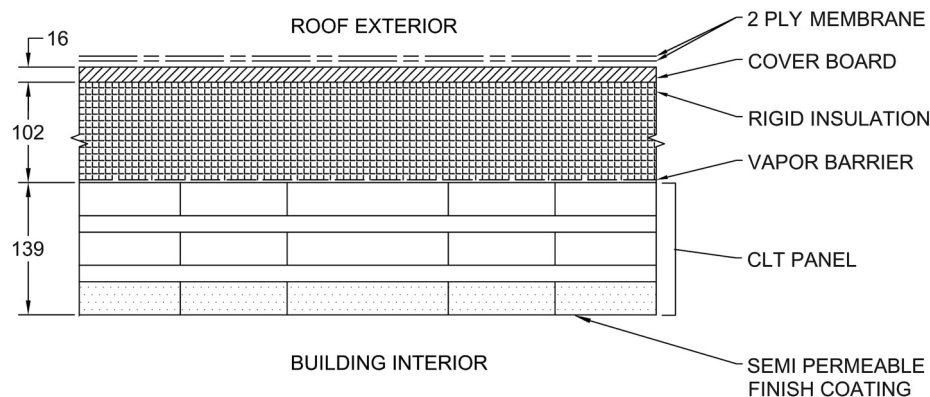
Cross-section of roof assembly (dimensions in mm).
